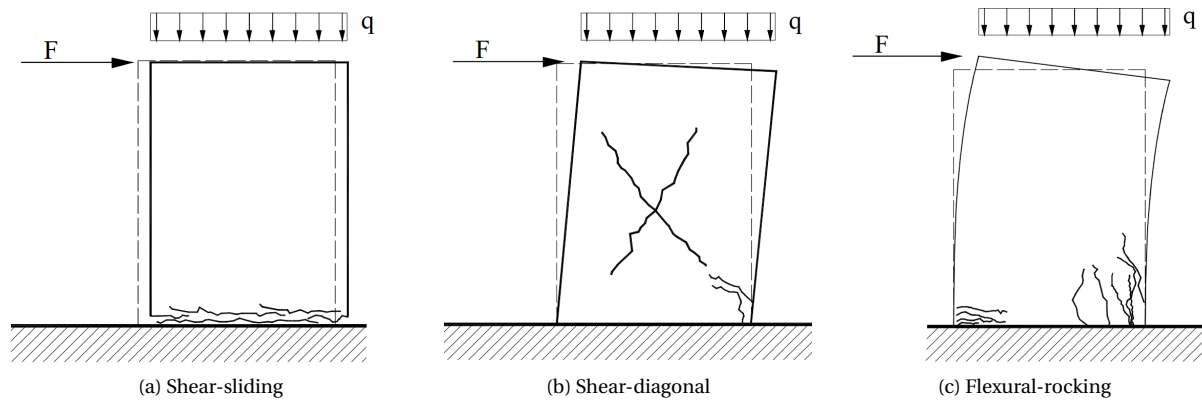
Masonry in-plane failure mechanisms
